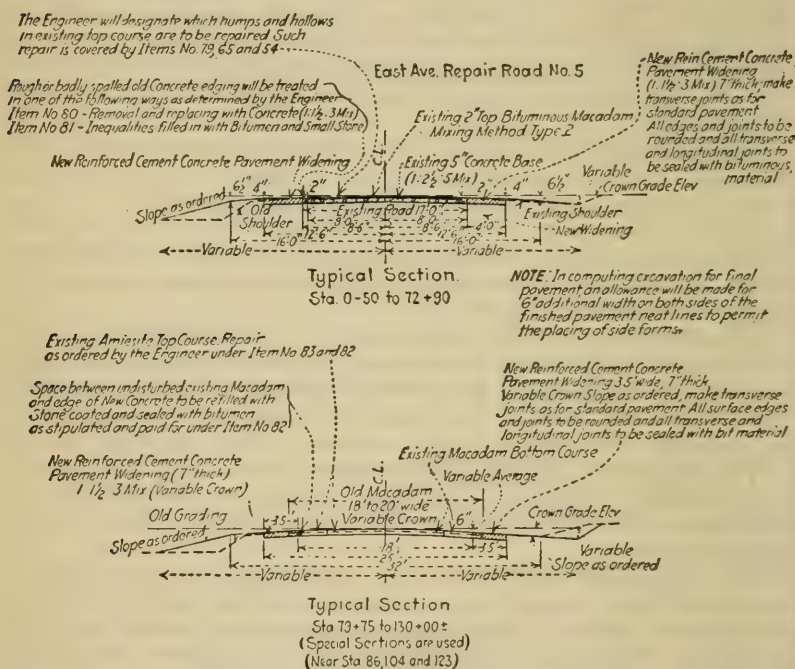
Design 1, Road 5, this design violates all principles of reconstruction.
